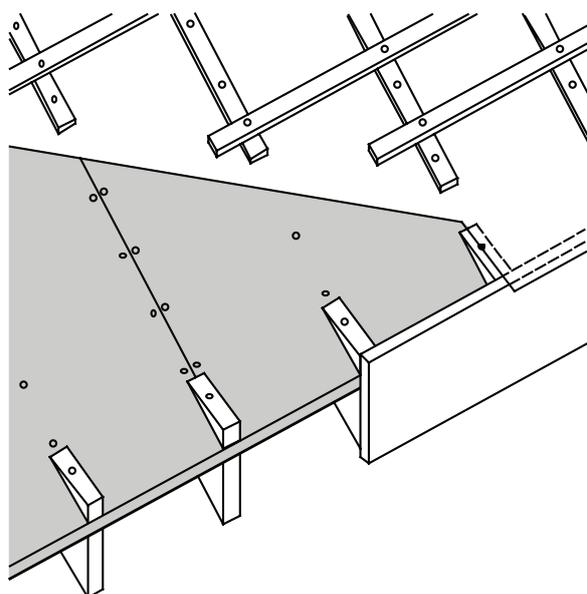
Typical pitched roof with sarking board and tiling underlay beneath the counter battens
